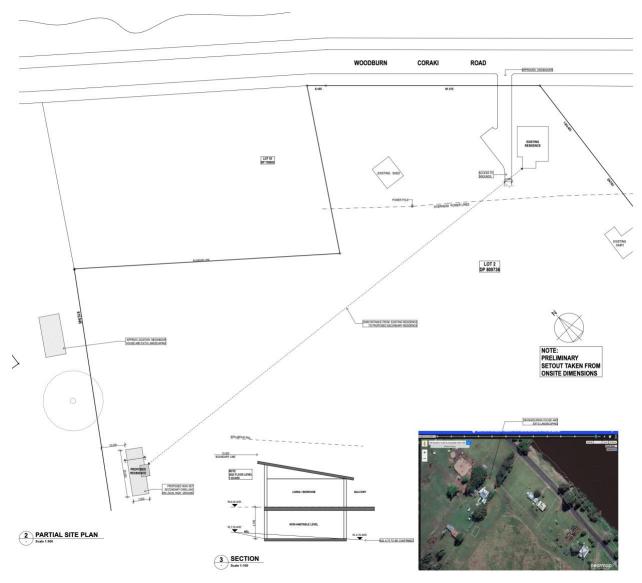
Site plan of proposed dwelling (source: RSA Architects SK-0001-C)
